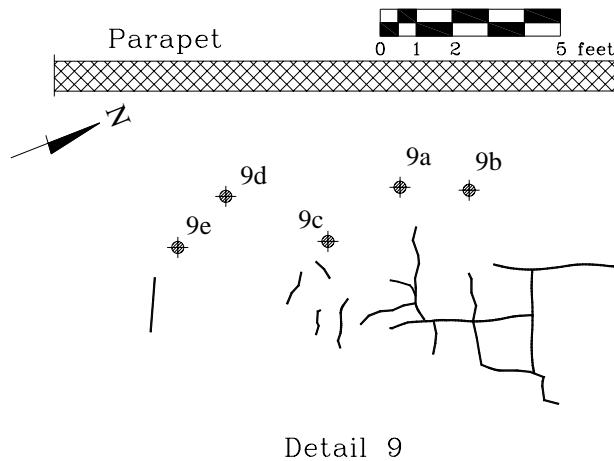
Map of cracks at coring locations for Bridge Deck Number 9
